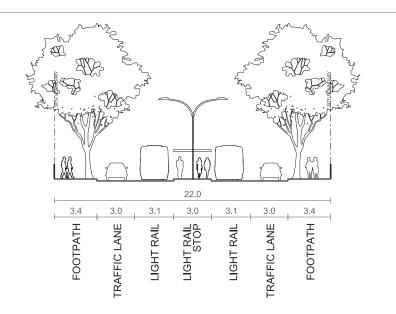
Section H2 -Rosebery Avenue General (Short Term)
